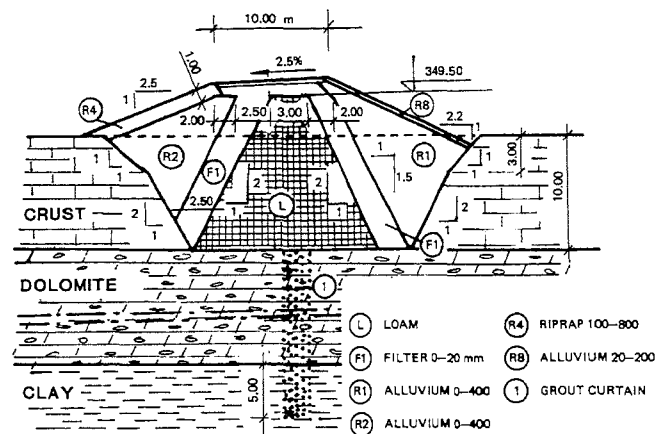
WADI-ZARAT DAM, LIBYA-CROSS SECTION OF
